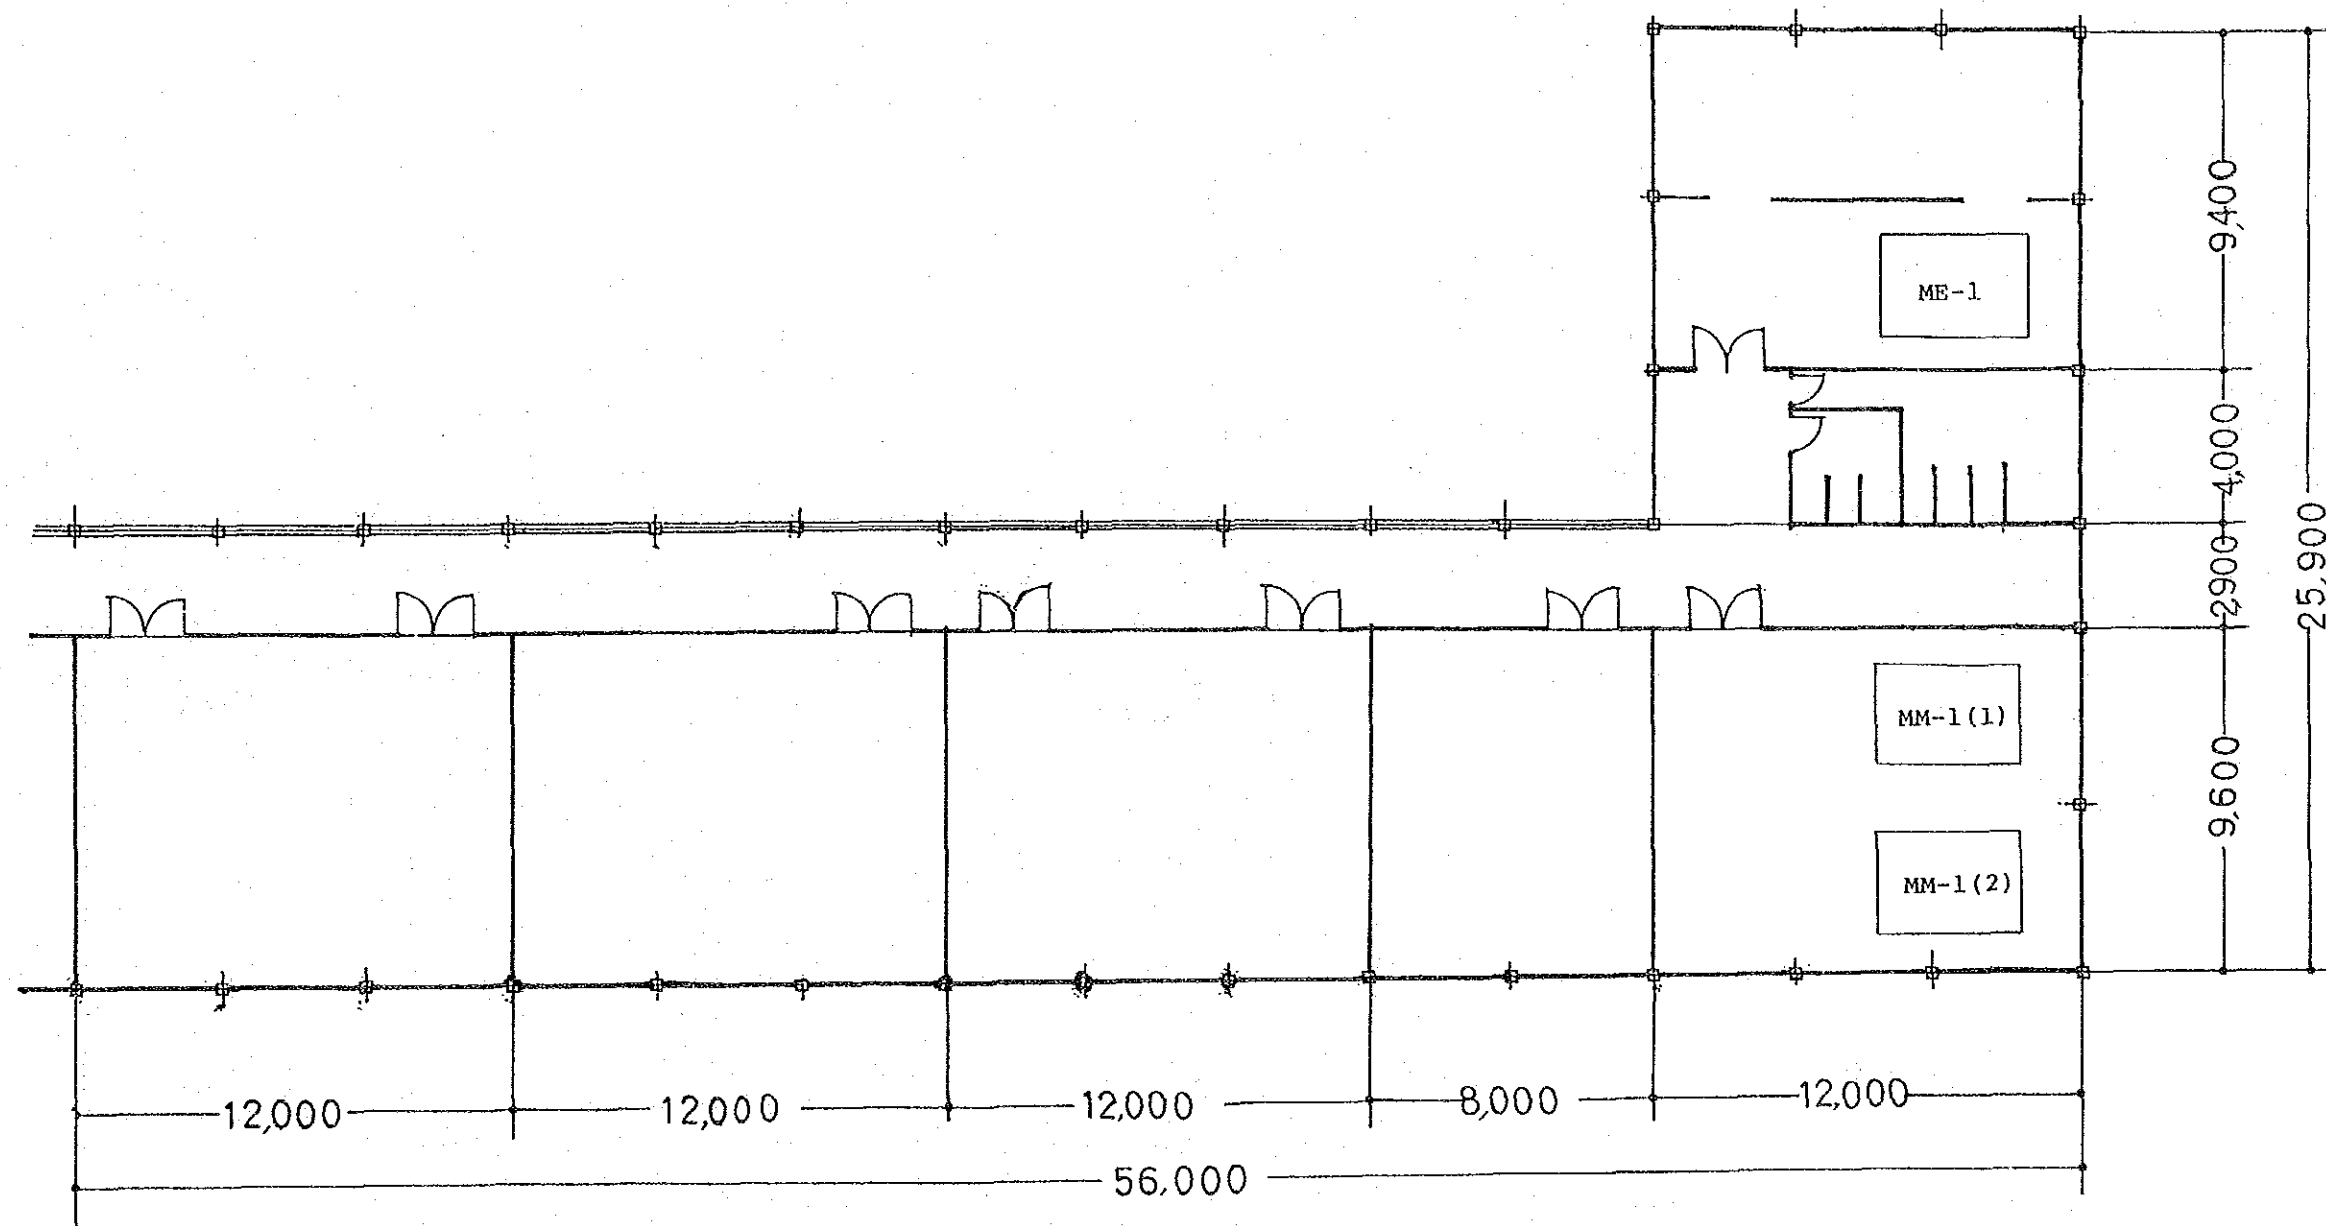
Layout Plan of Equipment in 2nd Floor of Building 3
